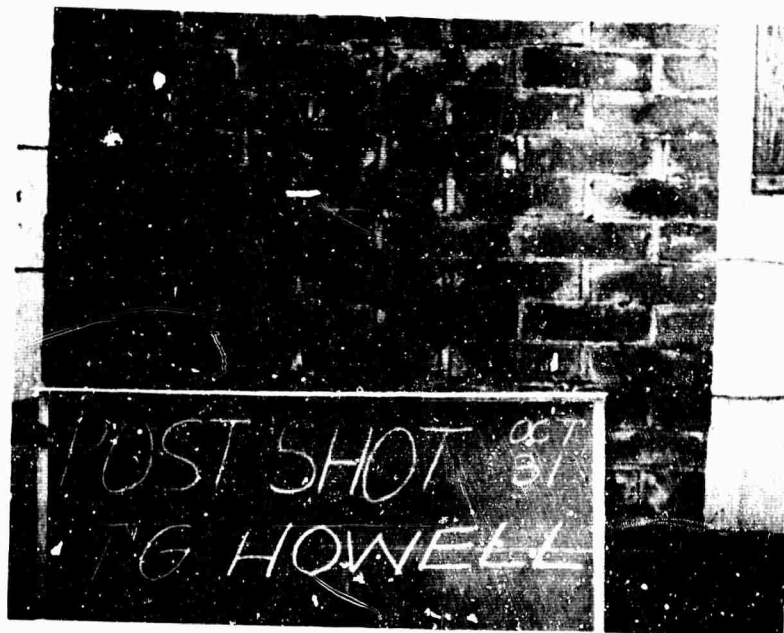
Postshot Cracks in H&N No. 256 Chimney
